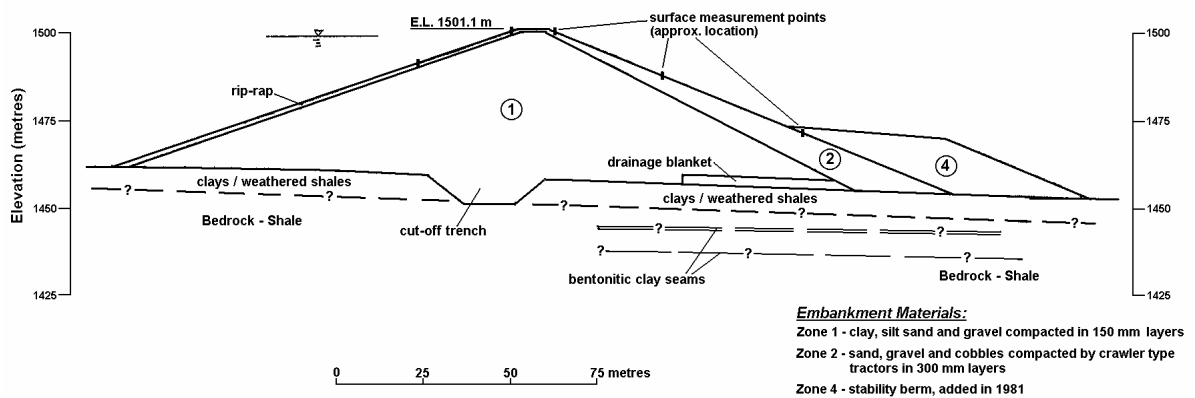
Pueblo dam; cross section of left abutment embankment at Station 75
